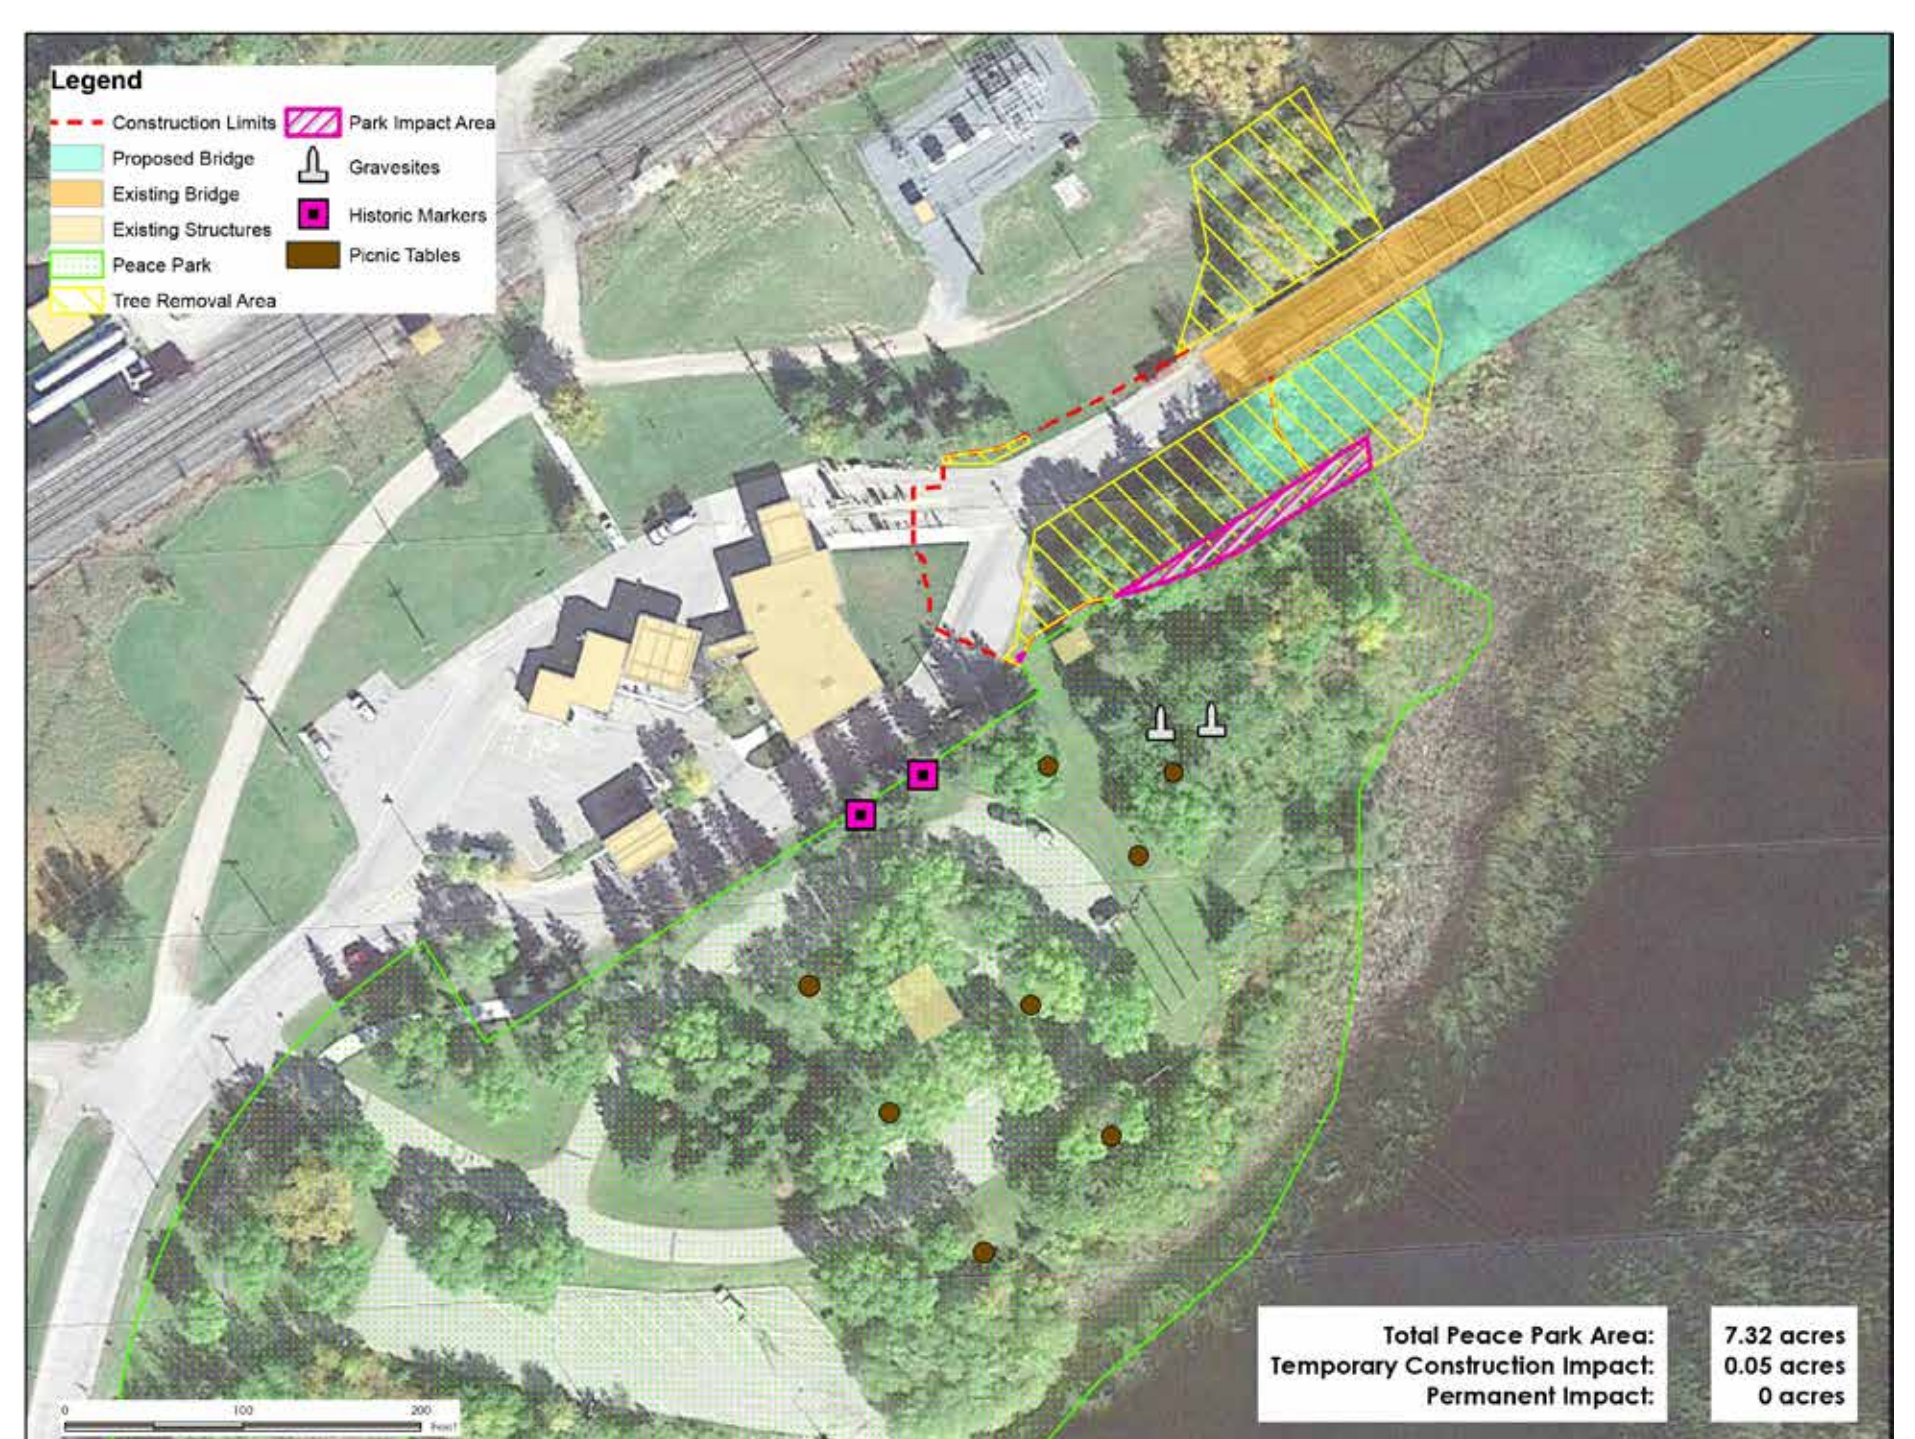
Temporary impacts to Baudette's Peace Park will occur during construction of new bridge abutment.
